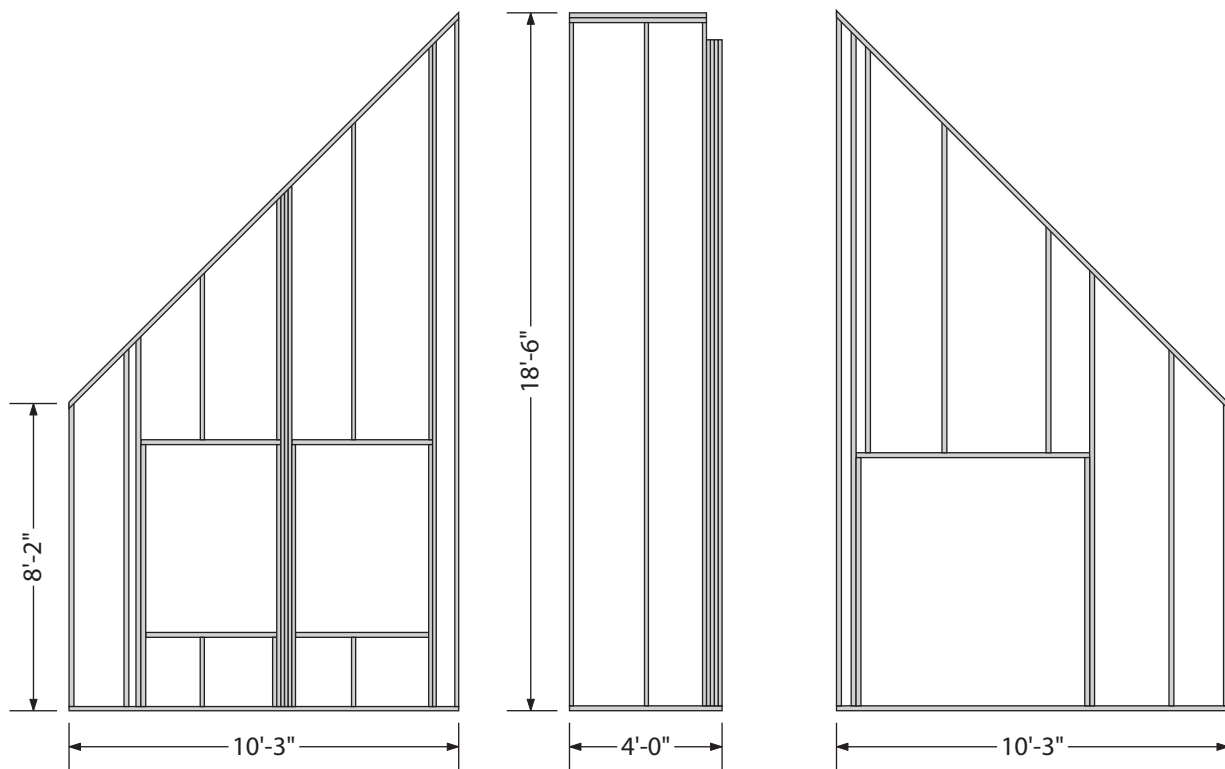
Raked wall framing for front walls of the Ladysmith Vacation Cabin
